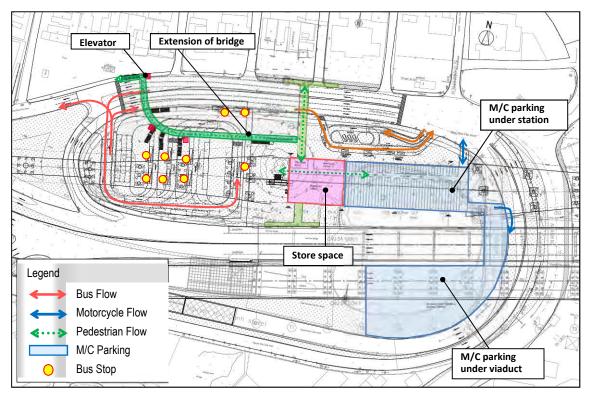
Concept Plan of Tan Cang Station Area (upon UMRT opening)
